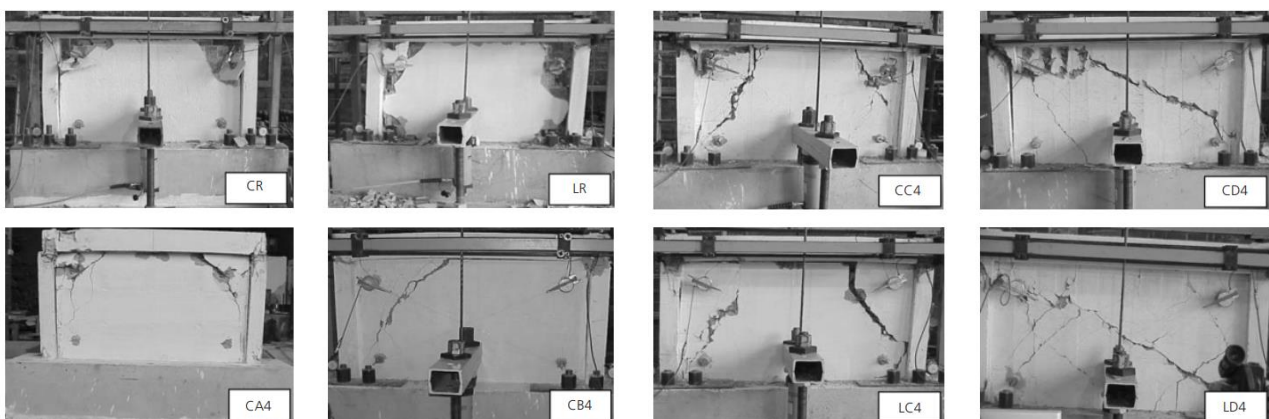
Part of the specimens, of prefabricated concrete infills, tested by Baran et al. – Source: [44]
